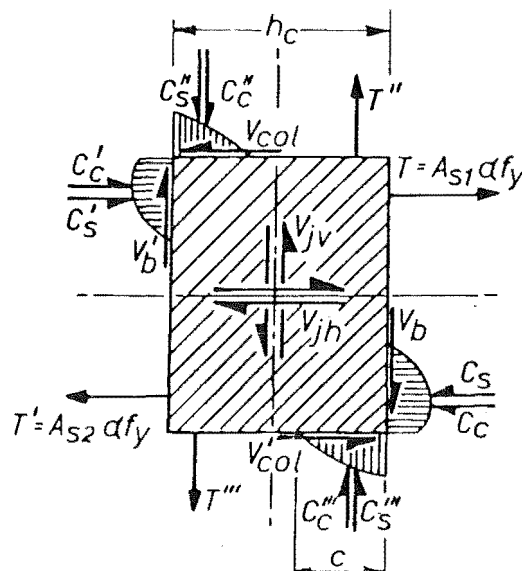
INTERNAL CONCRETE AND STEEL FORCES AT A JOINT
